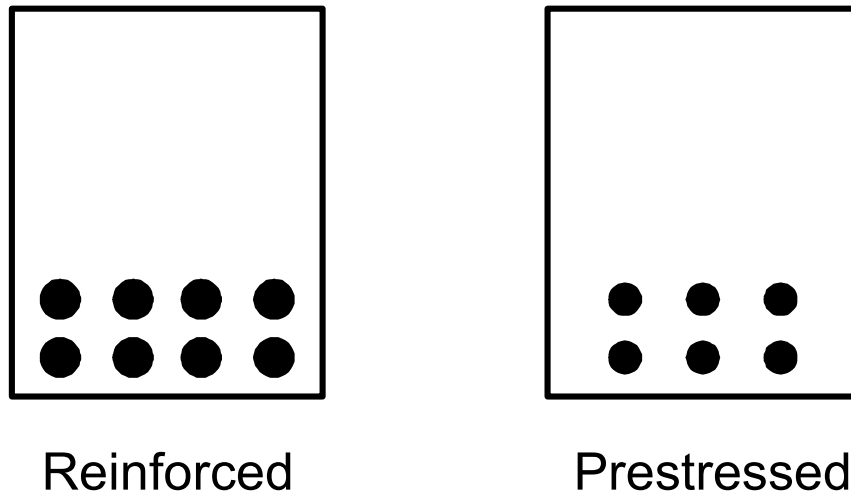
Mild Steel Reinforced Concrete vs. Precast Prestressed Concrete
